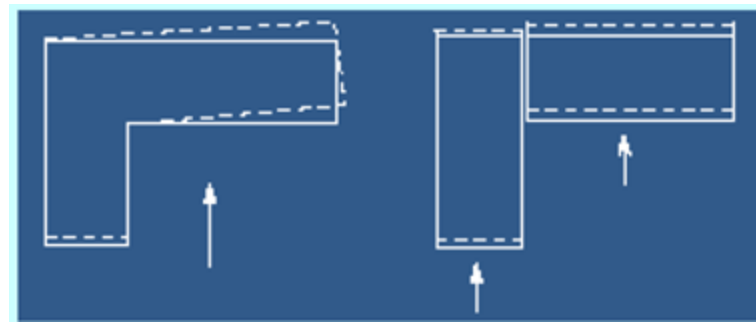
Pounding can occur between adjoining buildings due to horizontal vibrations of the two buildings.
